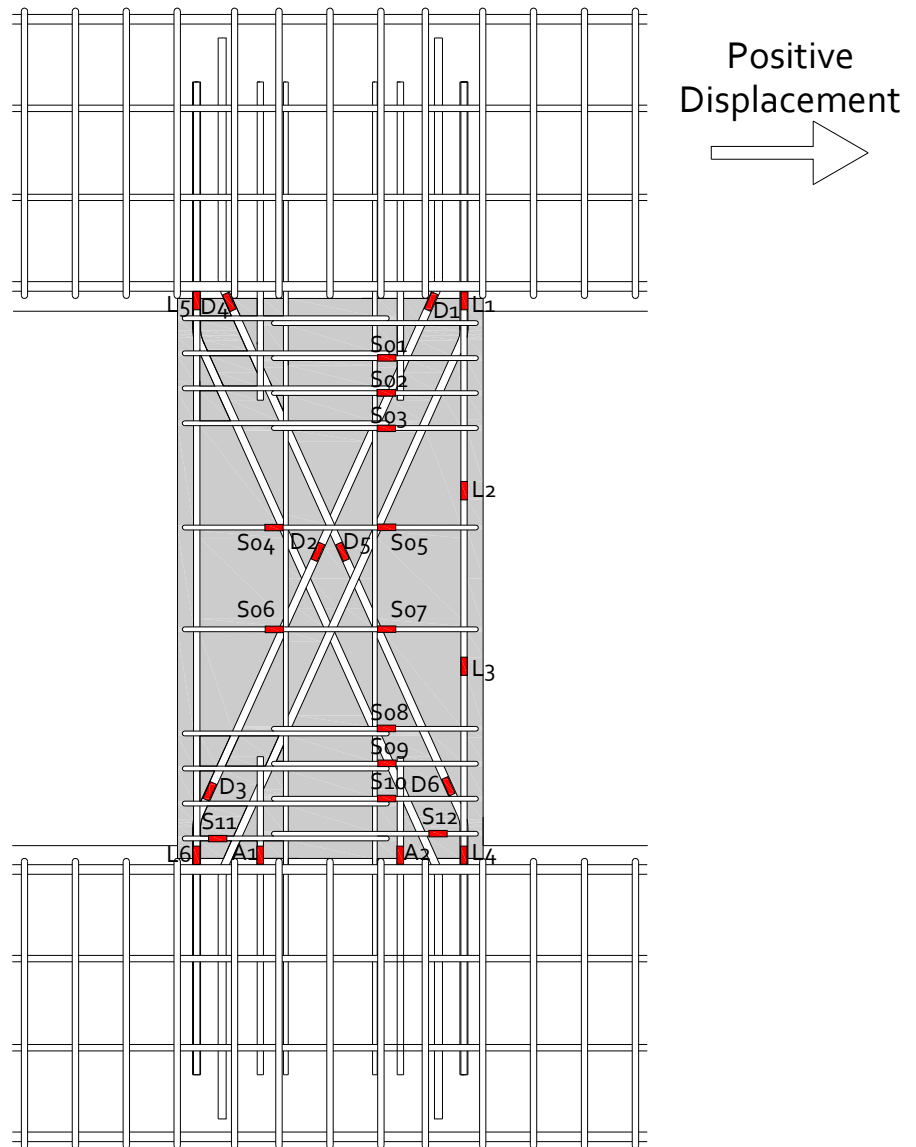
Specimen CB-3 strain gauge layout (gauges D4 and L2 were damaged during casting)
